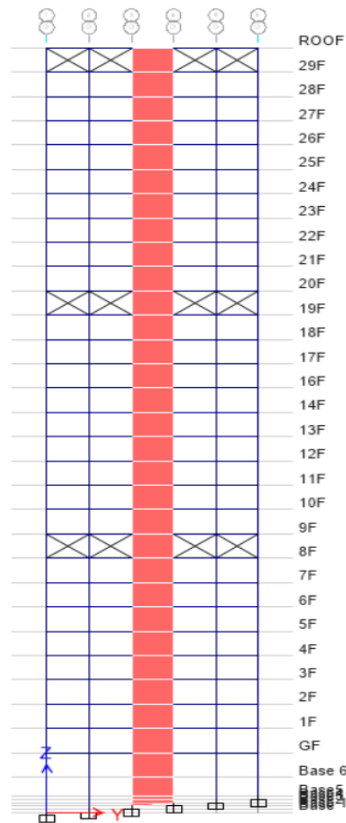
Elevation view of three outrigger bracing system for 5 degree sloping ground.
